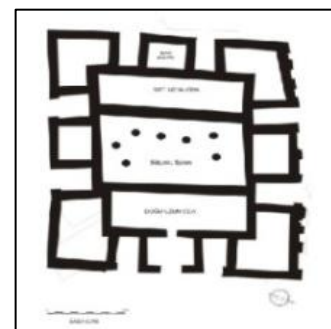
columned hall of Baba Jan Tepe (Goff, 1970)
